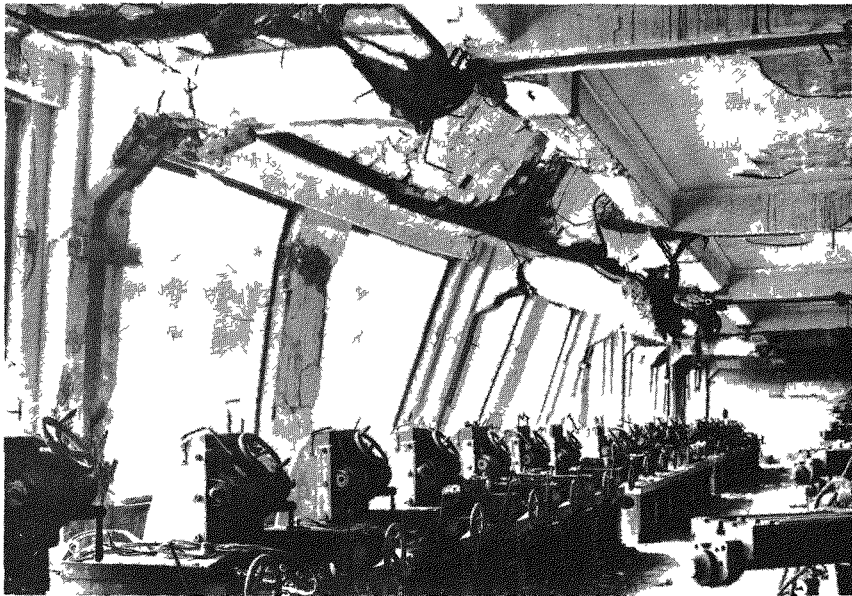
85b Multistory reinforced concrete frame building showing the failure of columns and girders (0 36 mile from ground zero at Nagasaki)
